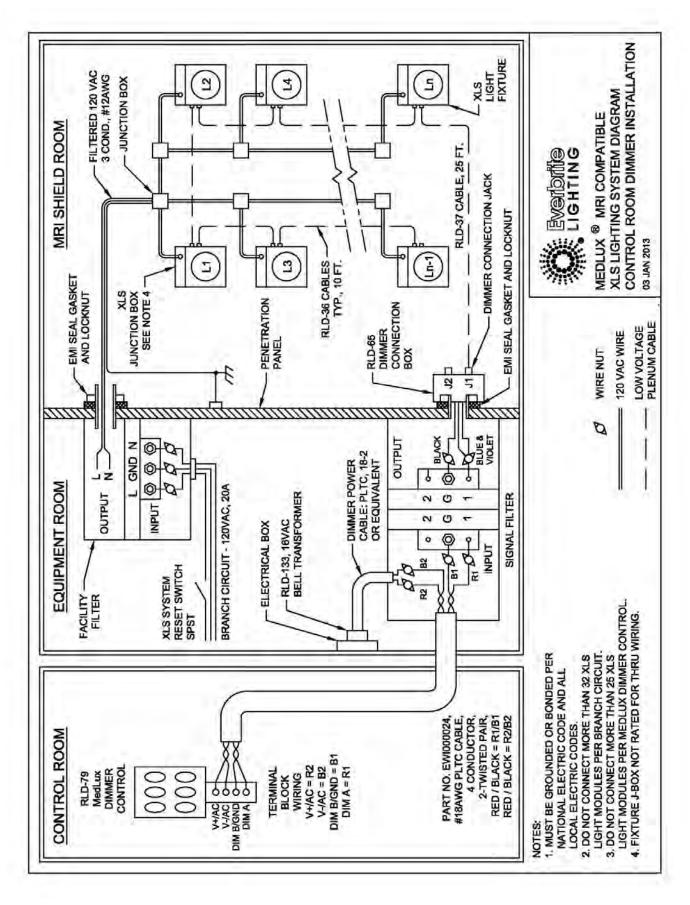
XLS Lights in Scanning Room with Shielded Cable and a Split Loop Configuration – Single Dimming Control Room Installation
